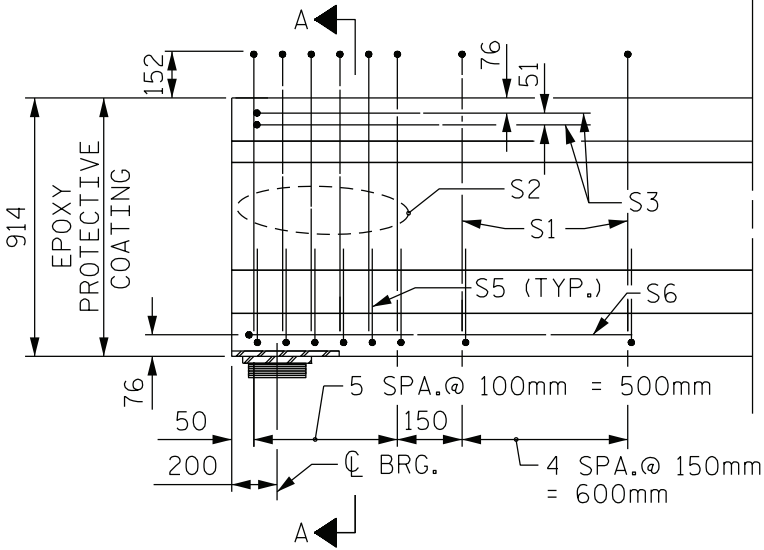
DETAILS FOR TYPE II PRESTRESSED GIRDER
